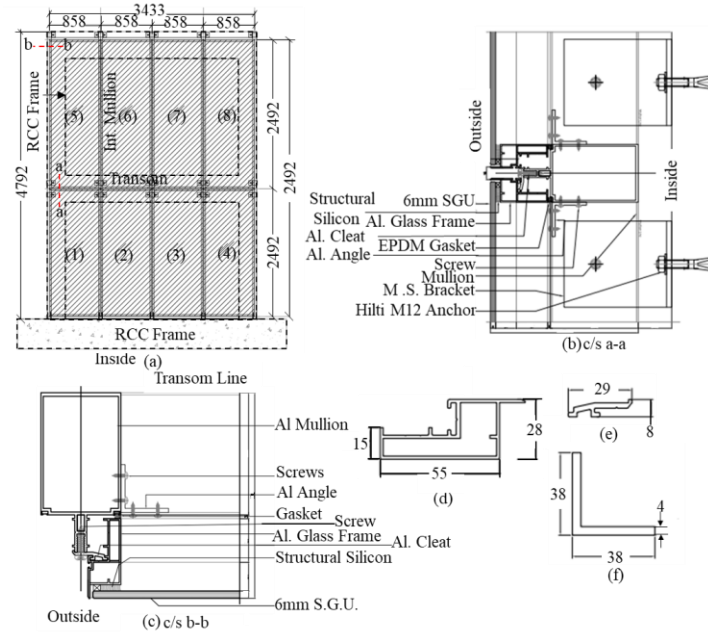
(a) GCW frame details (b) Intermediate mullion/transom joint details (c) Mullion section (d) Glass frame section (e) glass section cleat. (f) Al. angle at the joint.
